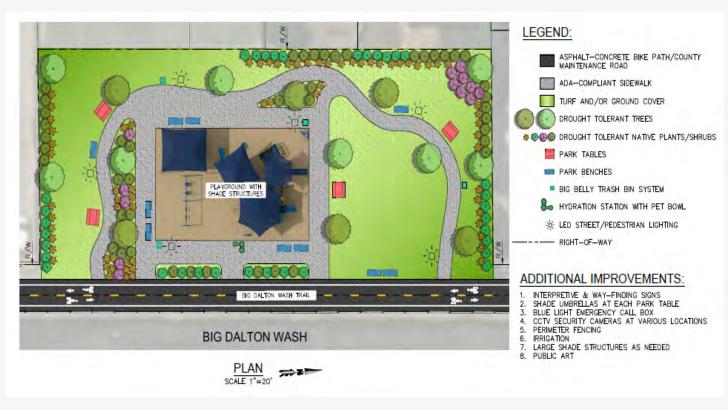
Big Dalton Wash Greening Project Garvey Avenue Pocket Park
